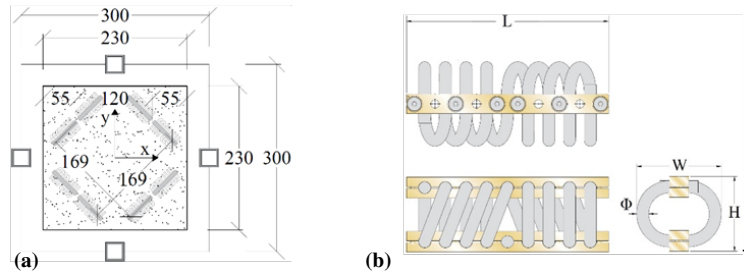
(a) Configuration of a single unit cell equipped with steel wire ropes; (b) details of a single wire rope. Dimensions are in cm.
